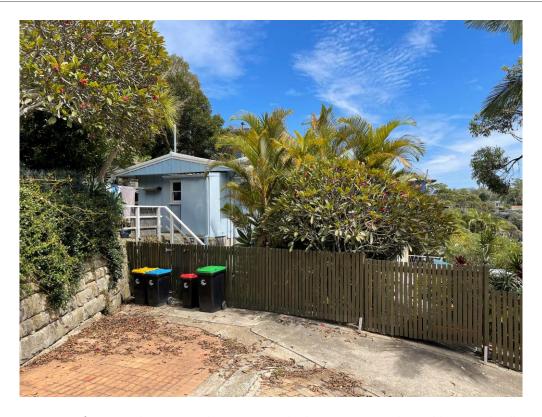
View of existing driveway and turning area, looking west towards neighbouring dwelling at No 148 Whale Beach Road
